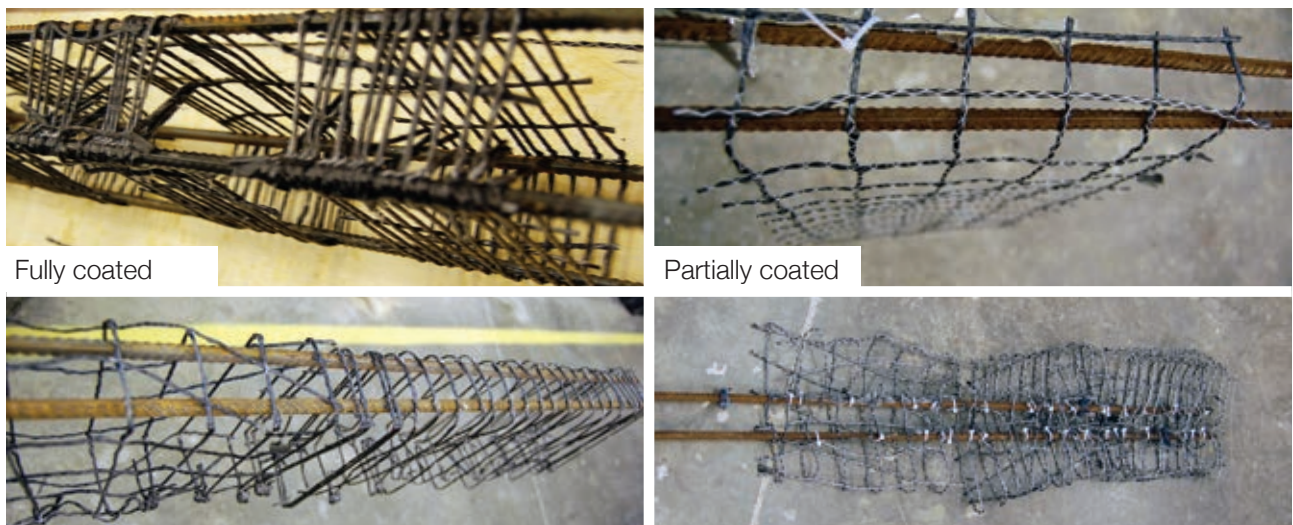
CFRP grid fabrication for Beam 10\_1 (left) and Beam 10\_2 (right).
